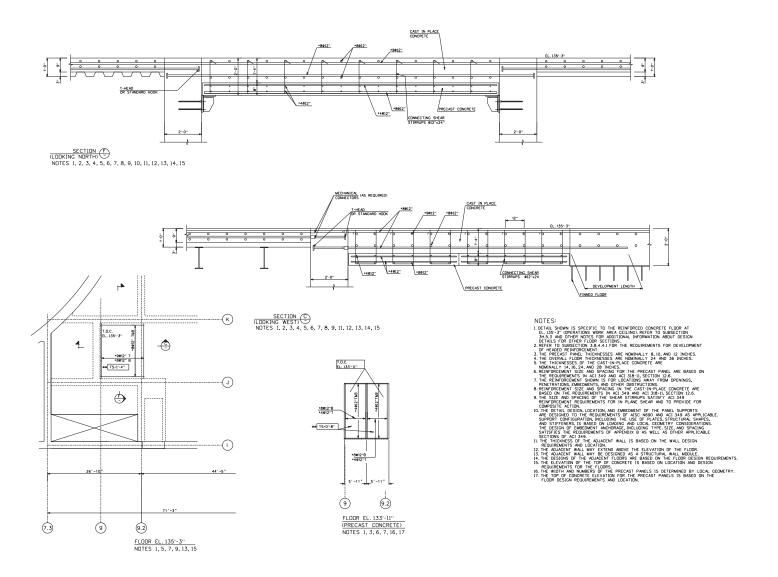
H.5-8 [Auxiliary Building Operations Work Area (Tagging Room) Ceiling]
